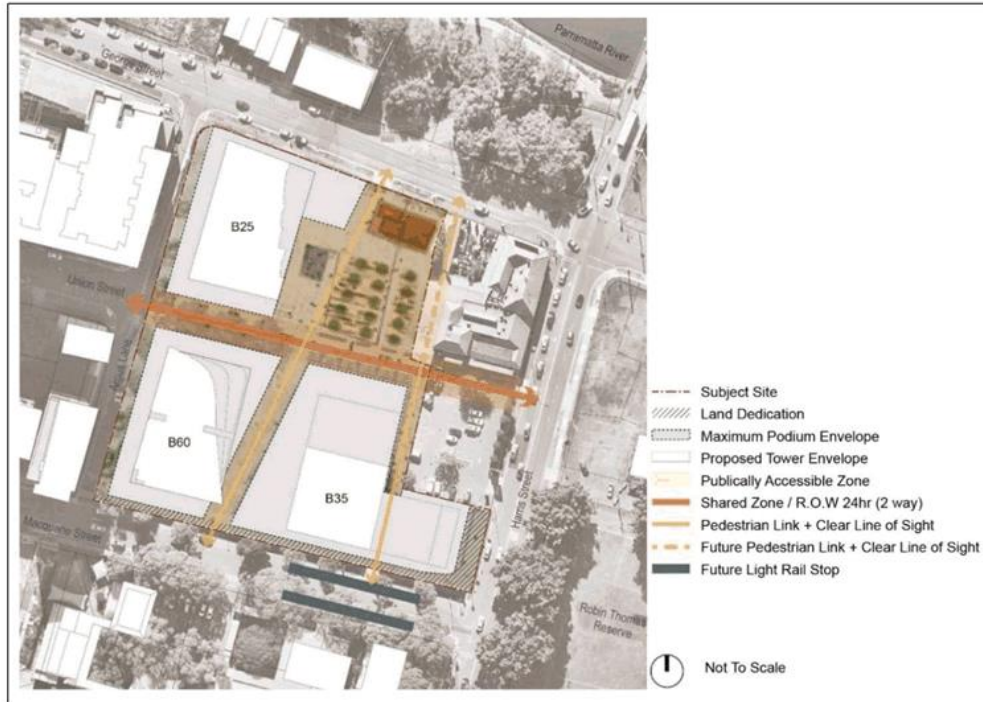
Master plan diagram for 142-154 Macquarie Street
